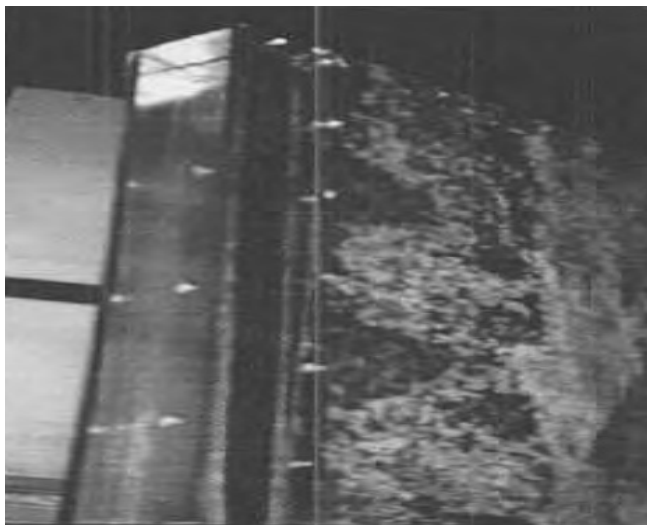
Pull Through of Fasteners from Studs (DS_1) (Serrette et al. 1997)
